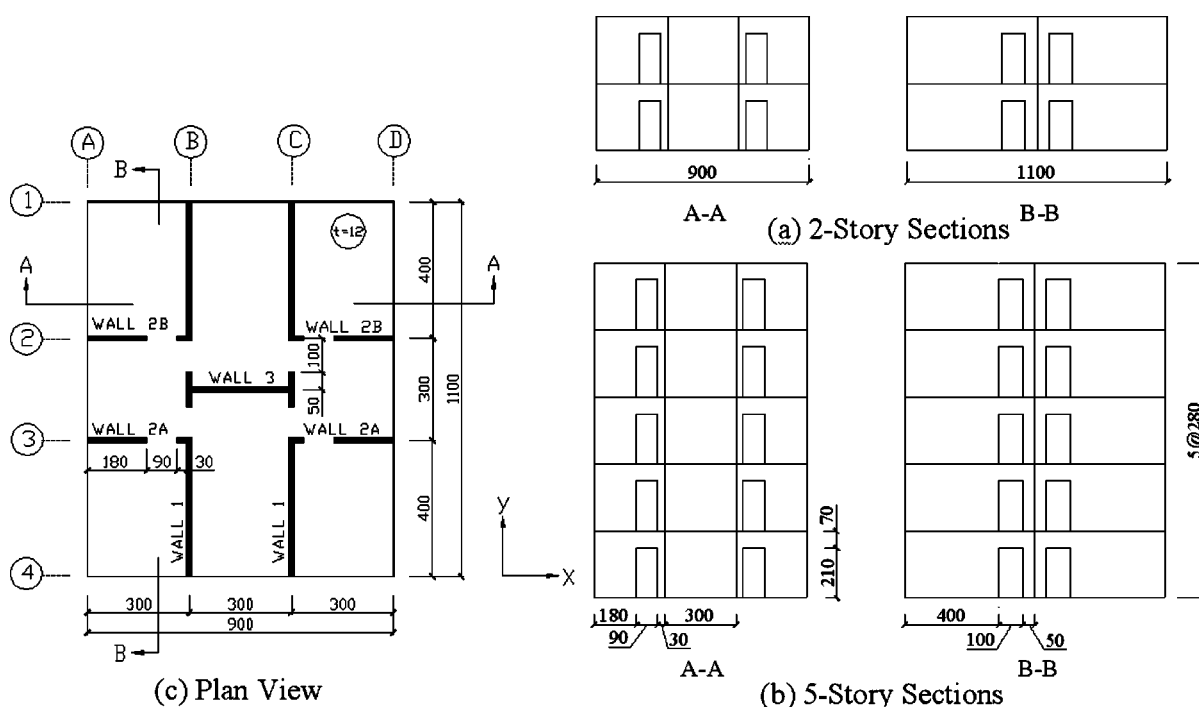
Typical plan and section views for two- and five-story buildings (units are in cm)
